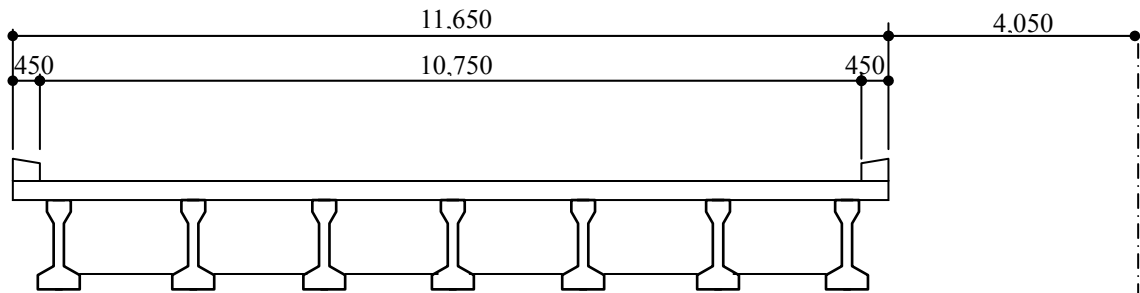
Road Width Widening in the Structures (Effective Width)
